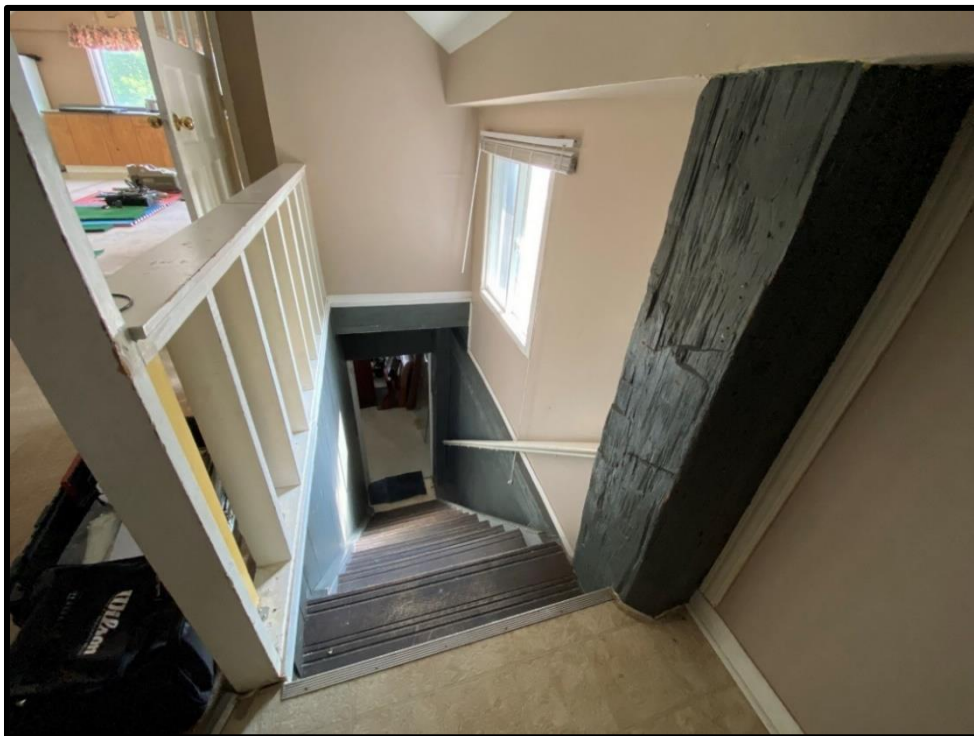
Staircase Showing Hand Hewn Beam at Top – Drywall Bump Out Showing Location of Connecting Tie Timber
